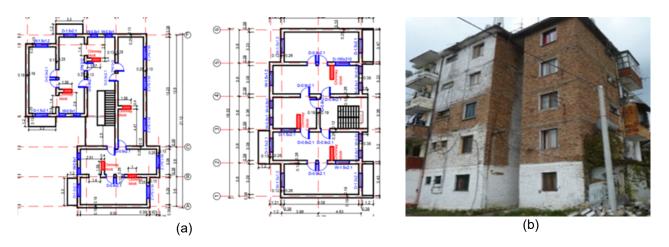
Mid-rise URM buildings: (a) standardized floor plans for five-story URM buildings (source: Bilgin and Korini, 2012)²⁵ and (b) a typical 5-story URM building in Thumanë, Albania (photo: EEFIT).
